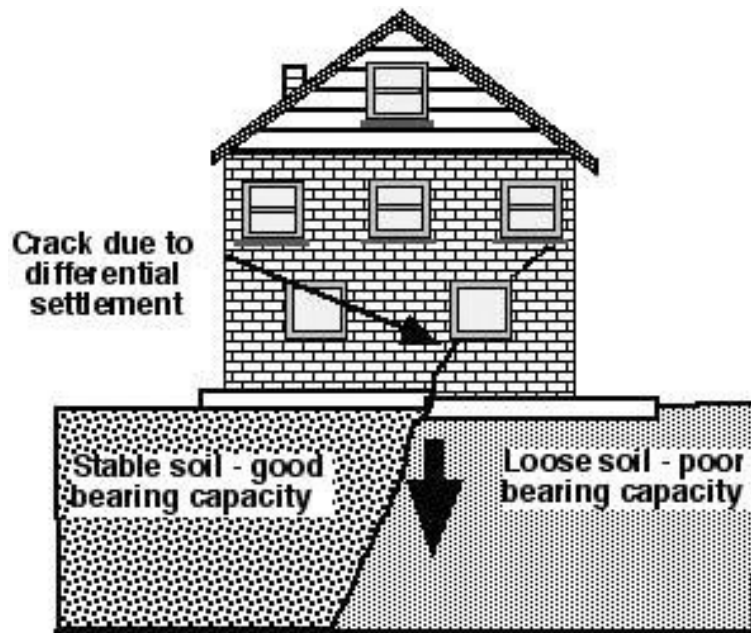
Example of differential settlement cracking in a building structure due to inadequate foundation design [9].
